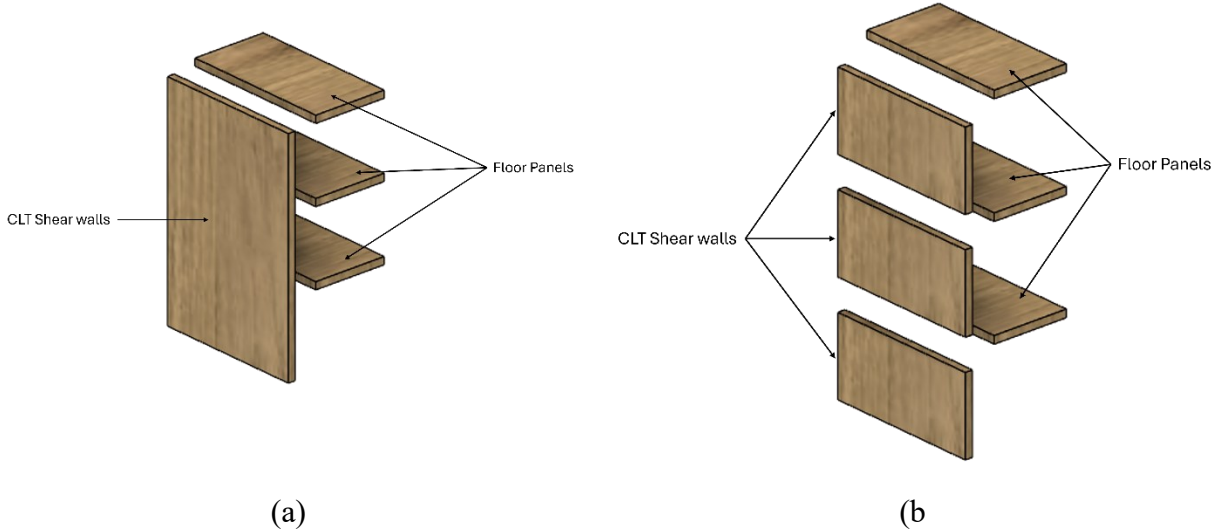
Construction Methods for CLT Shear Wall (a) Balloon-Type CLT Construction (b) Platform-Type CLT Construction
